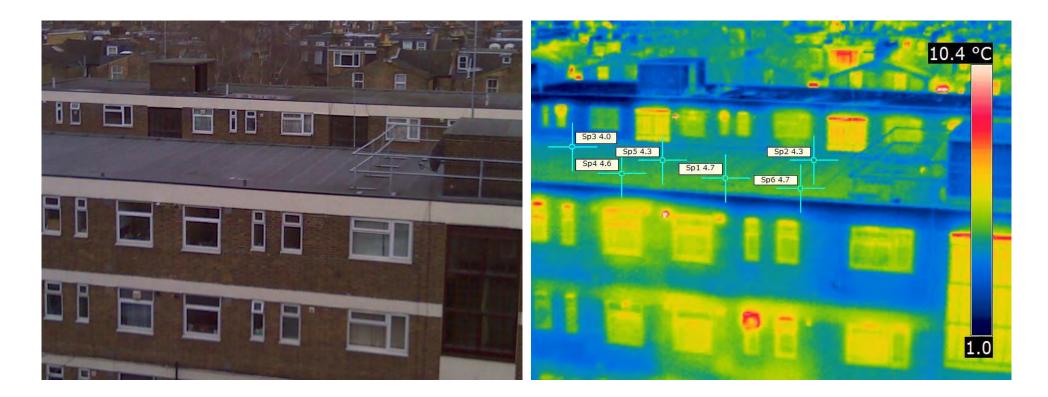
Photo and infrared image of bare roof on building neighbouring Richard Knight House, 21st January 2016. Image showing the temperatures on the flat roof area of a neighbouring building with similar construction to Richard Knight House. A FLIR QuickReport spotmeter was used to identify individual temperatures within the field of view. Infrared imaging reveals temperatures from 4.0°C to 4.7°C on the bare roof area. These temperatures were substantially higher than those on the green roof area of Richard Knight House (-2.3°C to -0.3°C from previous Figure). Again, it impossible to definitively assess whether this is due to the roofing felt being heated by the sun or whether it is due to heating loss from within the building but as these values are higher than the flat roof area in the previous Figure (which had no internal heating), it seems likely that at least some of this temperature difference is related to heat loss from rooms immediately below the roof.
